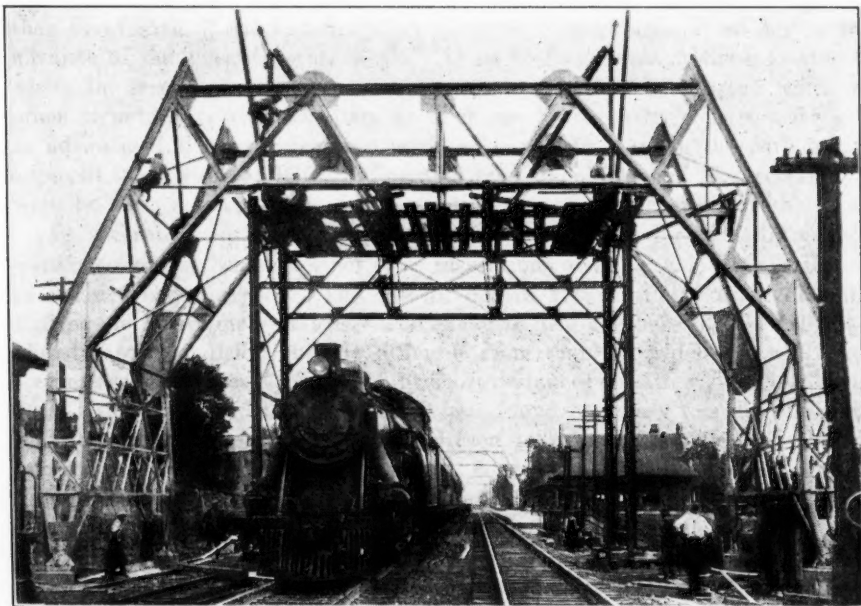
SPECIAL FALSEWORK USED IN ERECTION.
